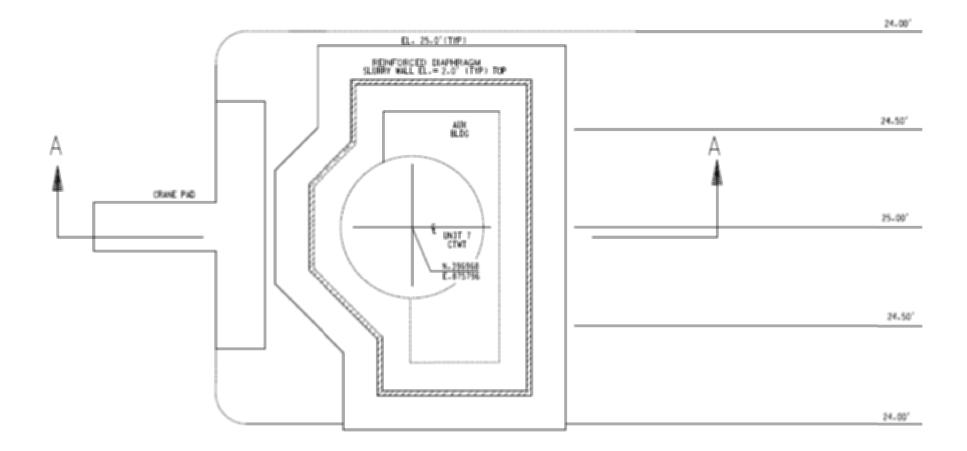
TPNP Unit 7 Excavation Limits Plan View (Reference 4)
